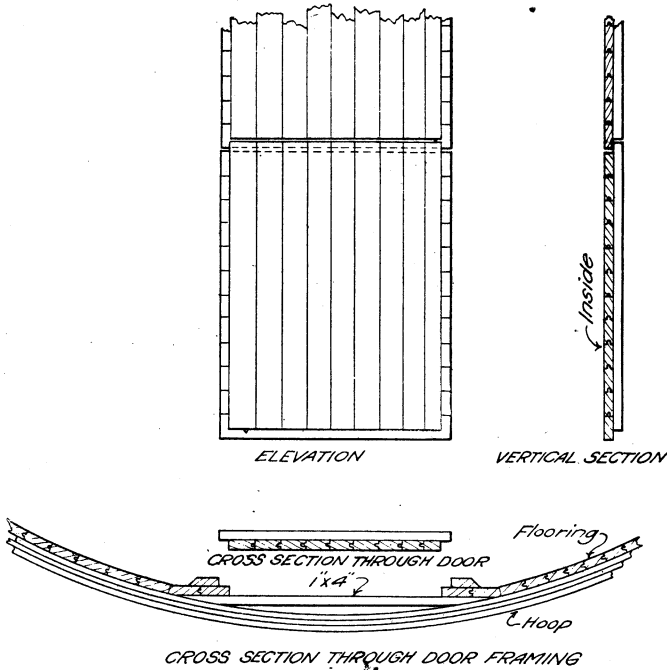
Showing detail of door opening and door for wooden-hoop silo.
